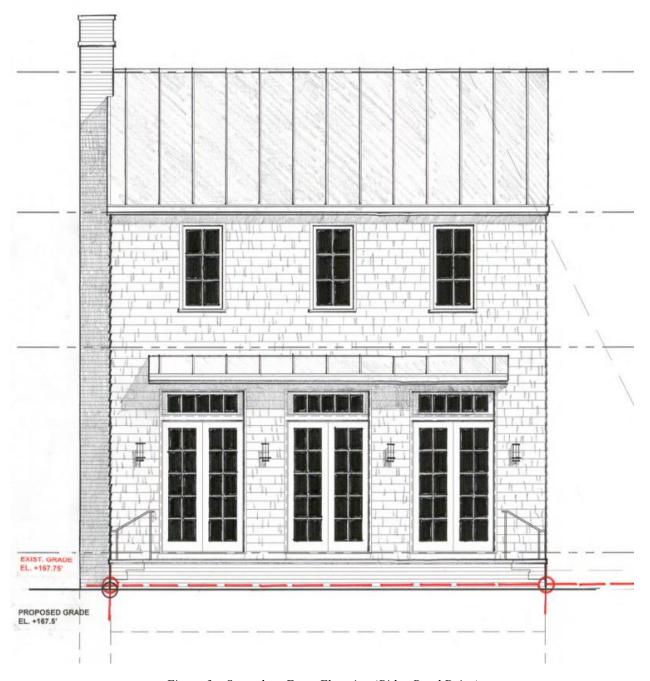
Secondary Front Elevation (Ridge Road Drive)
